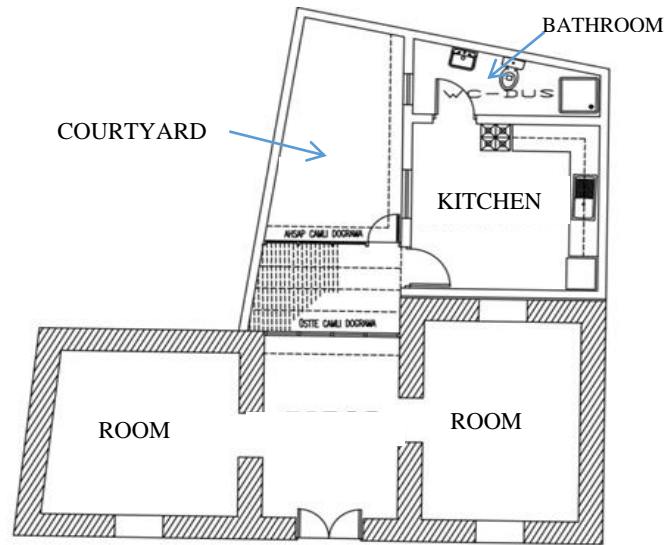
Room and toilet area detached from the kitchen in a different house plan (EVKAF, 2004)
